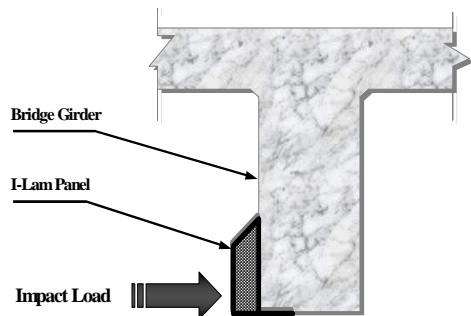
Over-height collision protection (scarifying) system for concrete girders
